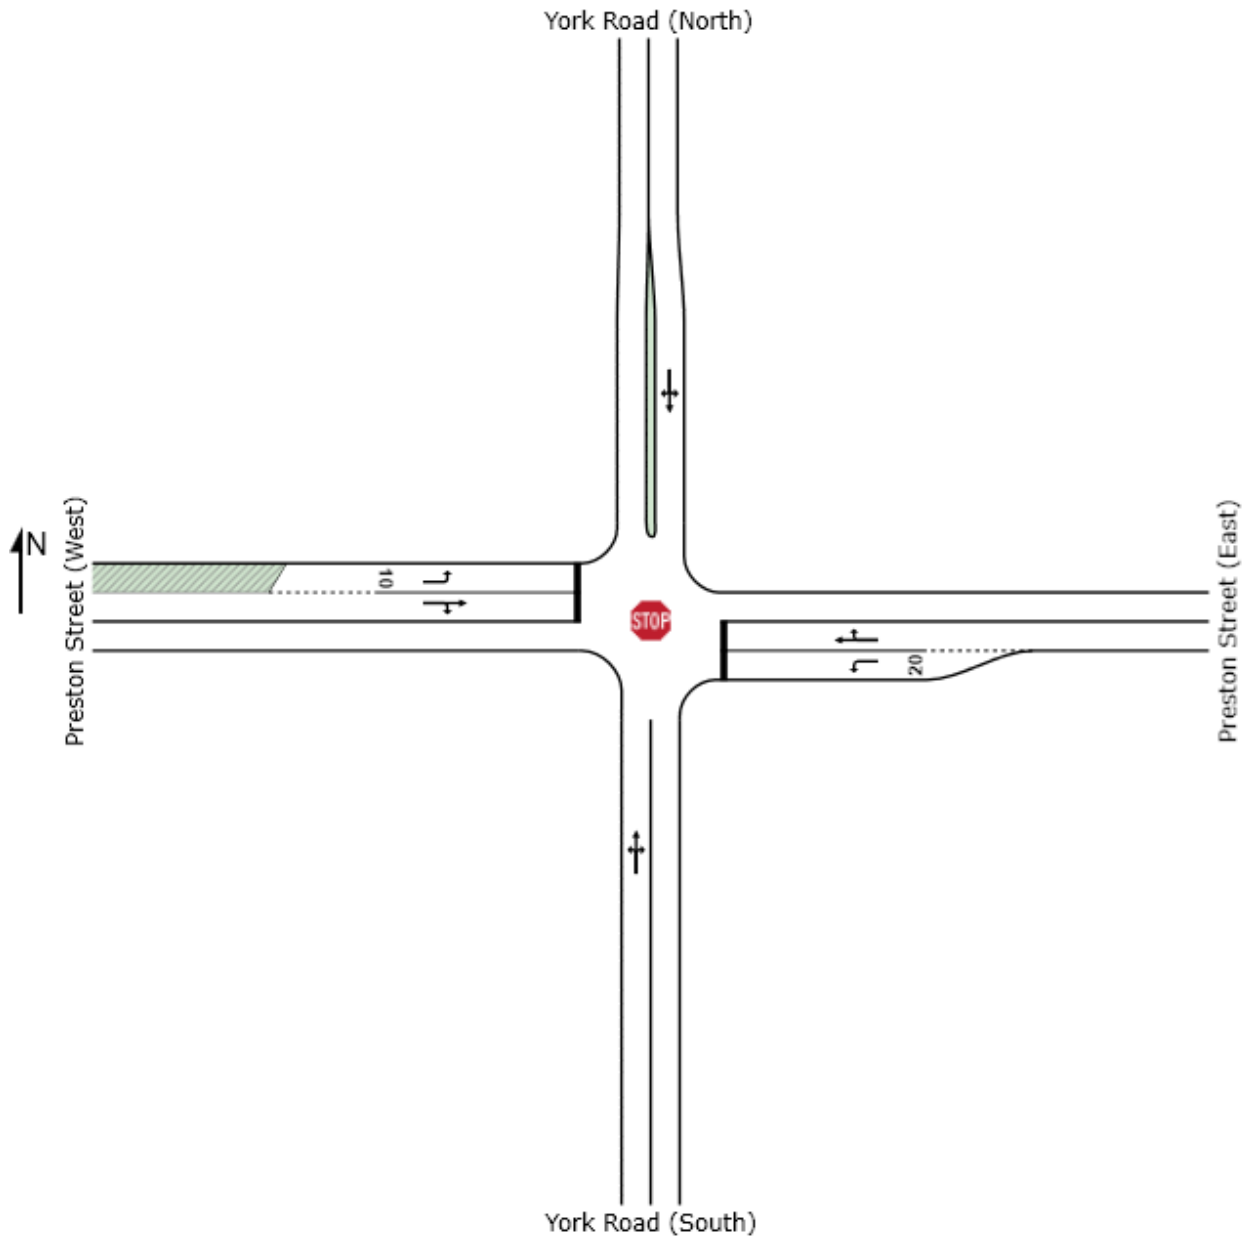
Stop-controlled intersection of York Road with Preston Street (SIDRA)
